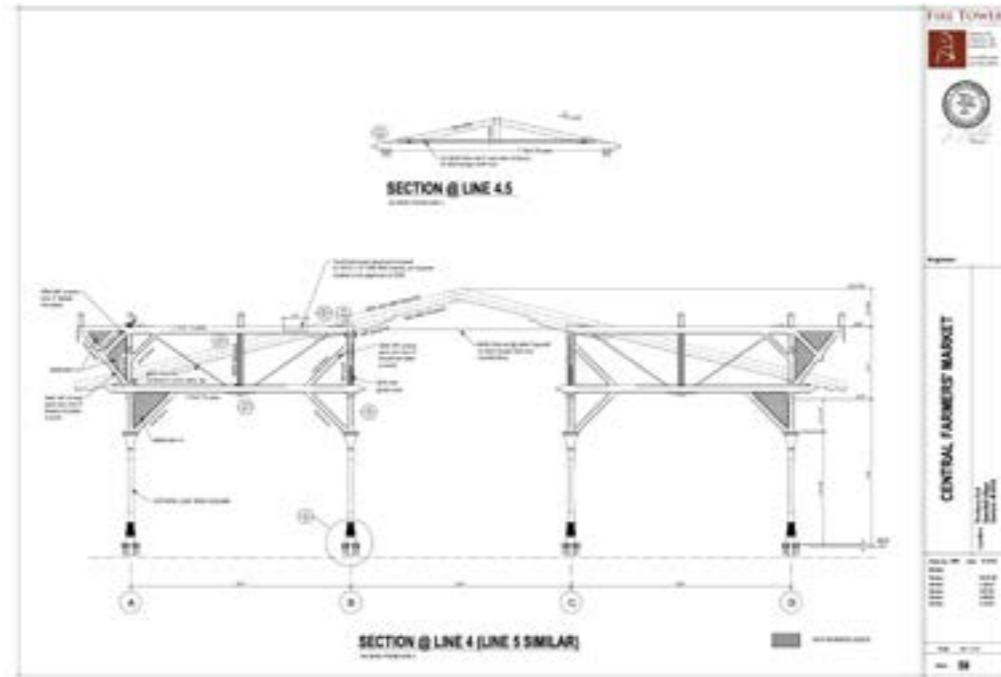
Sheet from the Fire Tower Engineered Timber drawing set showing the use of tension rods, steel brackets and compression posts to stiffen and reinforce the historic timbers (Fire Tower Engineered Timber)
